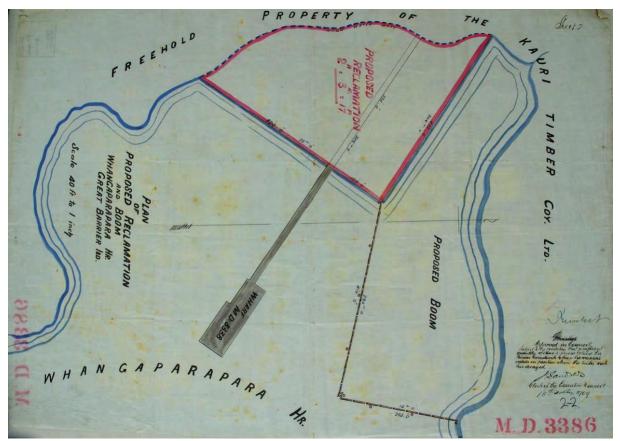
Marine Department plan MD3386(1909) showing the location of the wharf and proposed reclamation and timber boom.
